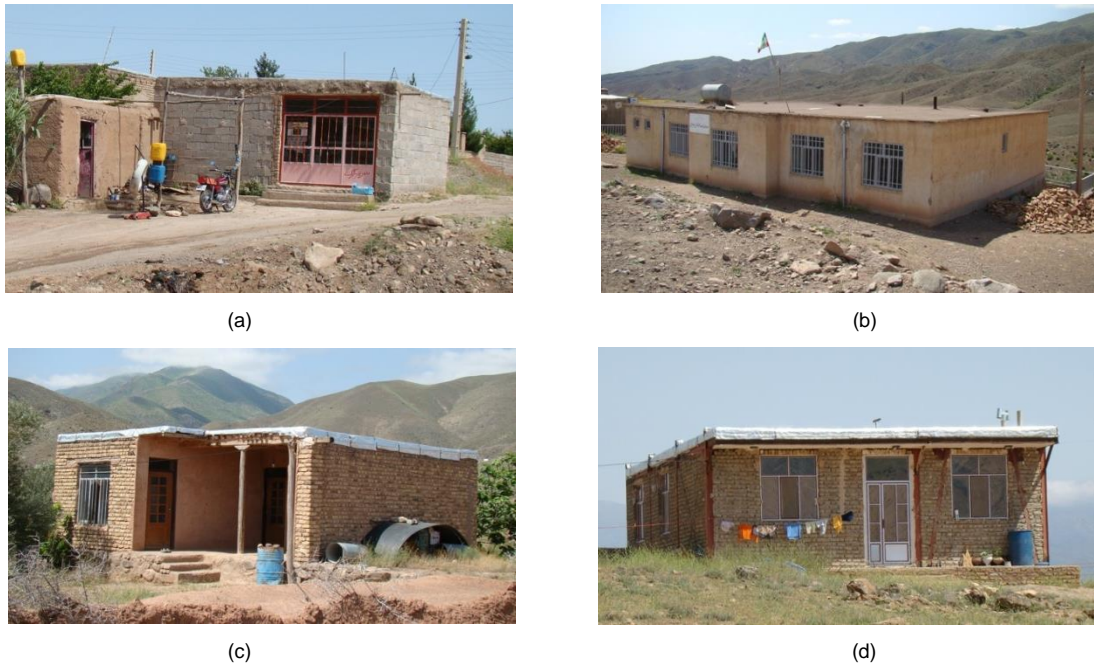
Sample of observed buildings in villages in different construction period. a) Unreinforced masonry building with wooden roof without proper lateral resistant system and an adobe annex; considered as vulnerable and constructed in reconstruction period. b) An unreinforced masonry school with horizontal ties in the roof level and missing vertical ties; constructed in reconstruction period and considered as weak, c) An unreinforced masonry brick structure without any appropriate lateral load resistant system; constructed in development period and considered as vulnerable. d) An engineering structure with proper design and construction. Considered as safe building and constructed in development period.
